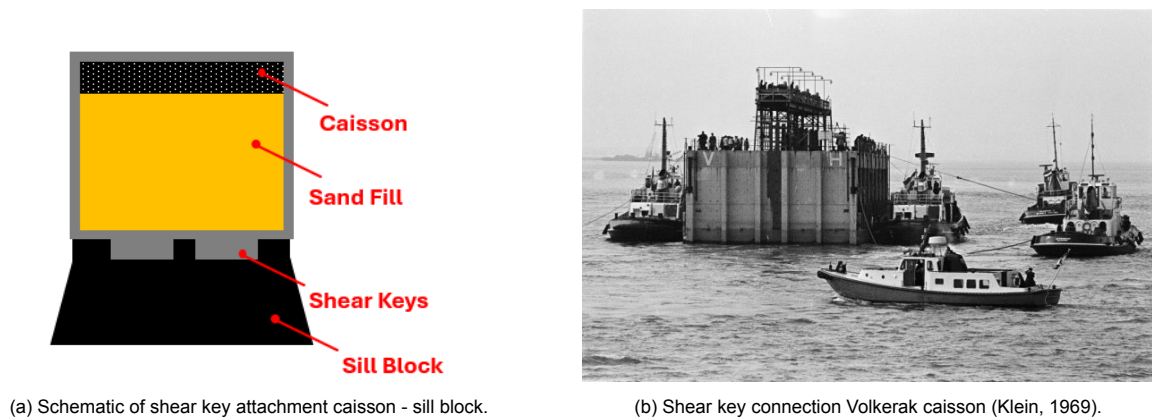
Shear key anchoring of caisson in hydraulic engineering applications.
